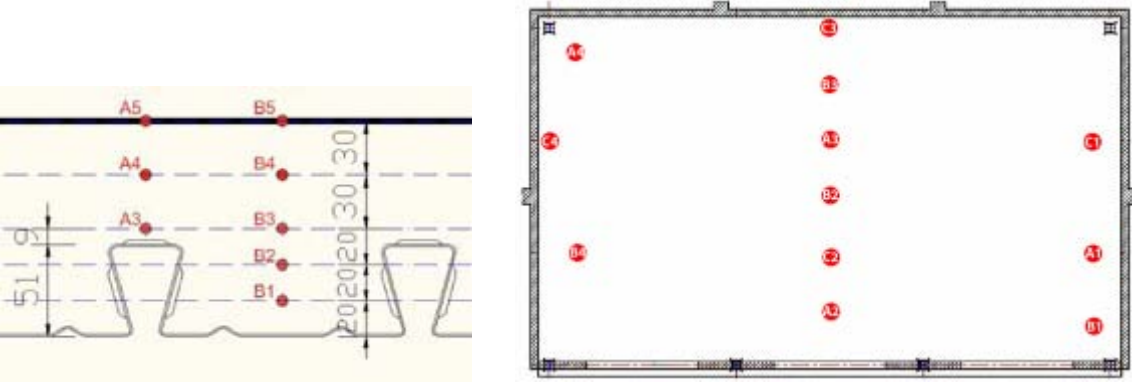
Thermal couple locations at slab cross and thermal couples plan
